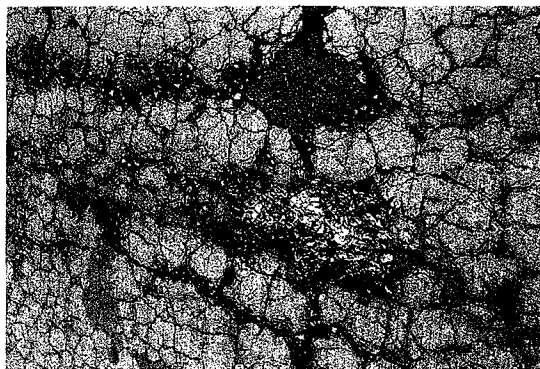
Typical damage and crack pattern, with local patchwork repairs.
